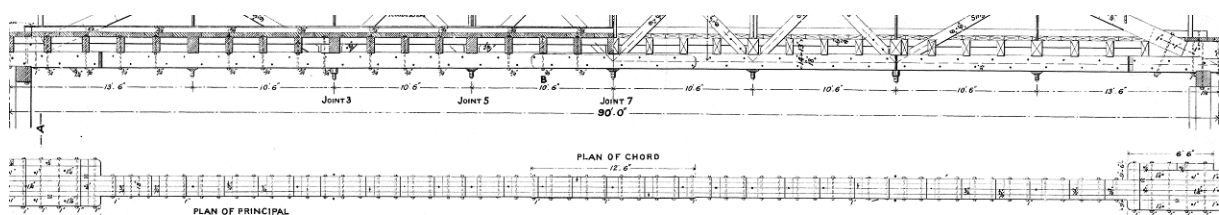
Notching of Bottom Chord in McDonald Truss – Plan for Standard 90' Span
